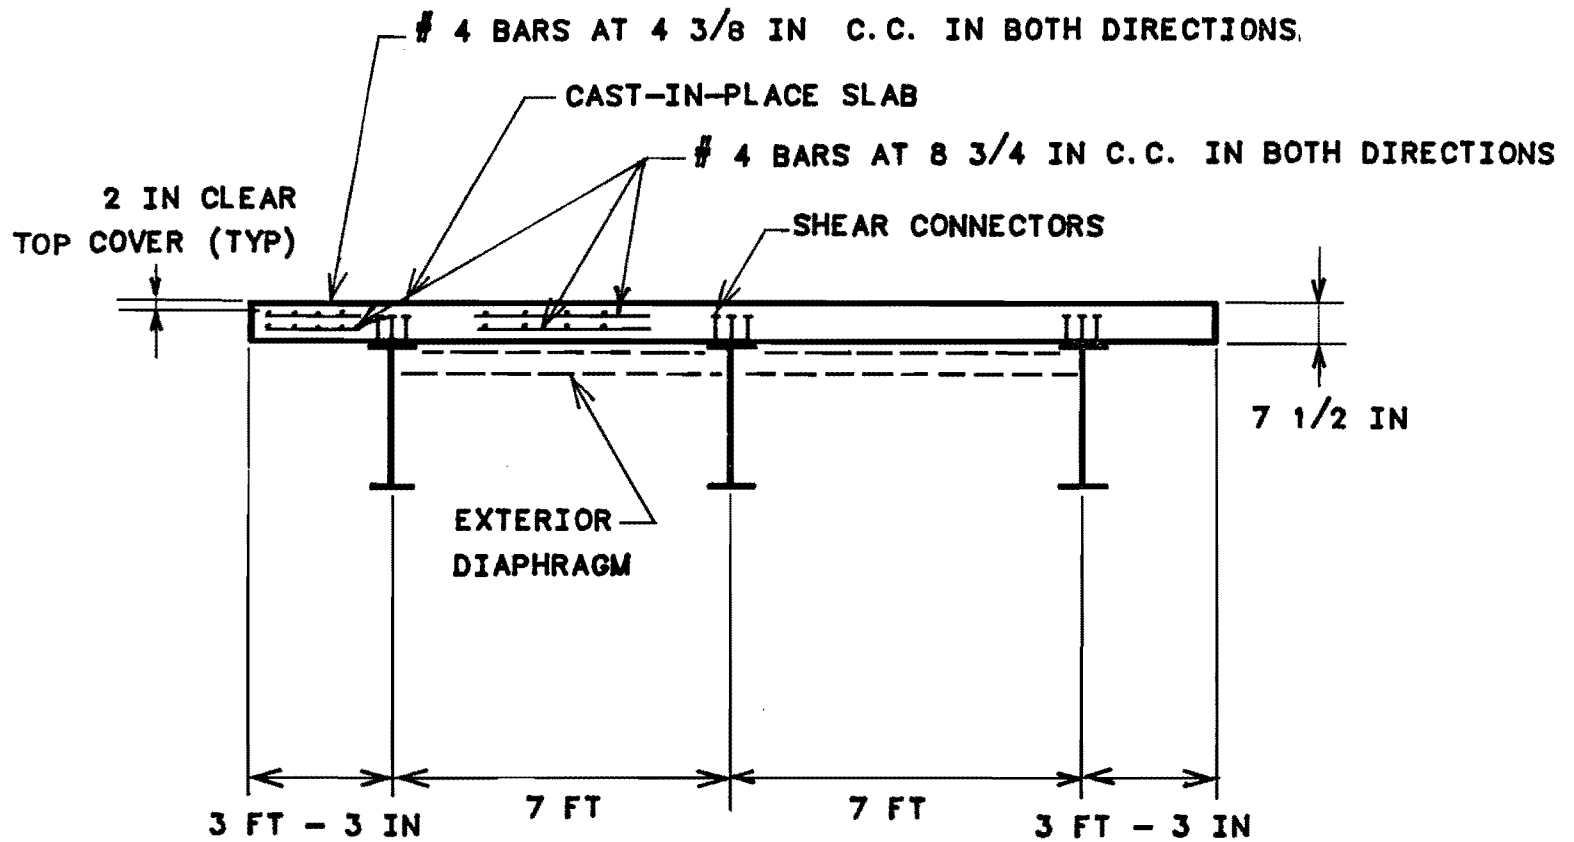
Cross section of laboratory specimen showing cast-in-place deck
